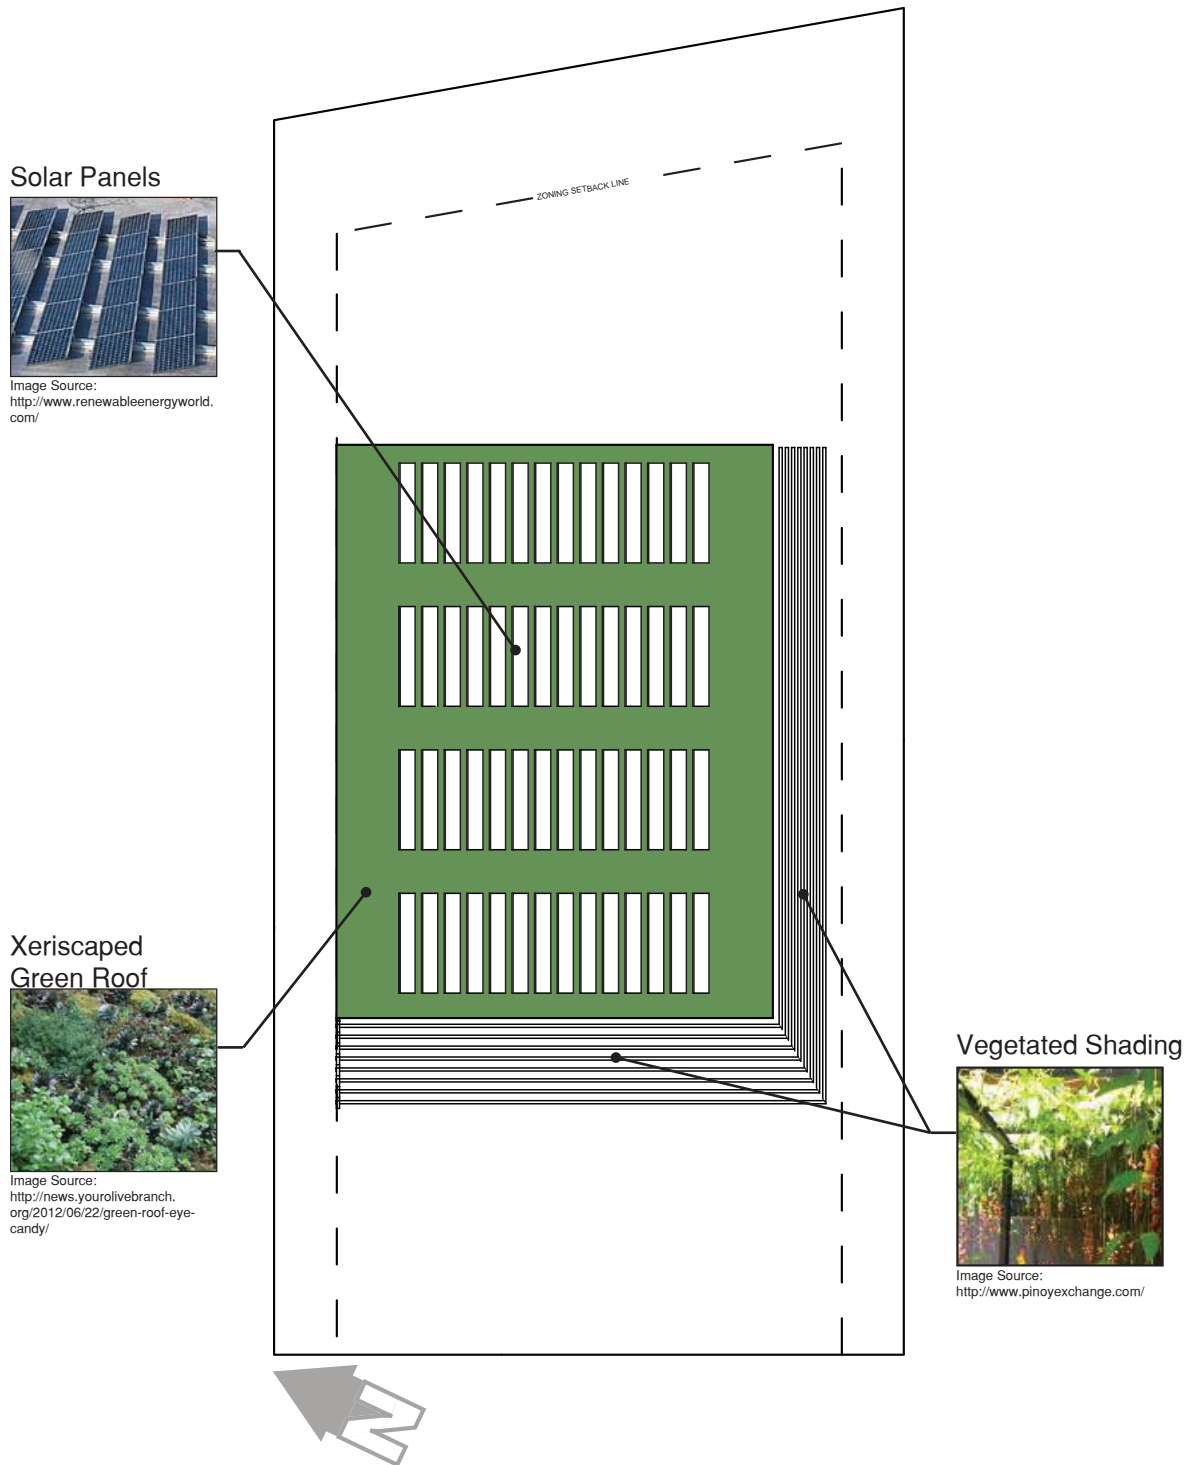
RESIDENTIAL DESIGN - ROOF PLAN
